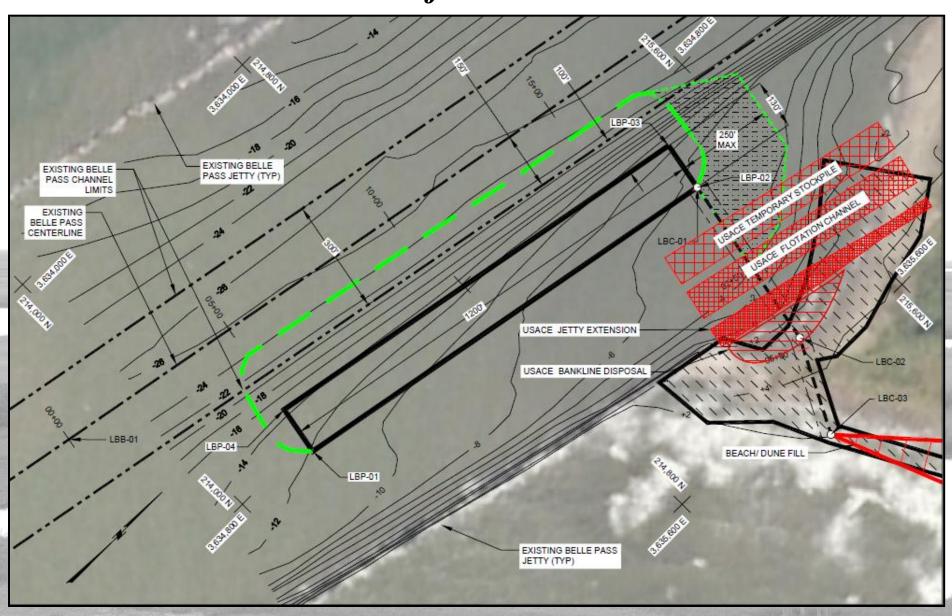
and 3. Theoretical crosssection (above) and plan view (left) of the jetty extension, flotation channel, temporary stockpile area, and bank line disposal area.
